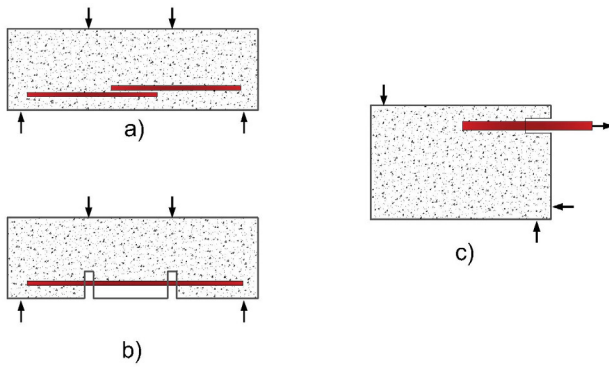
Schematic of Beam samples: (a) splice beam, (b) beam anchorage specimen, (c) end beam sample
